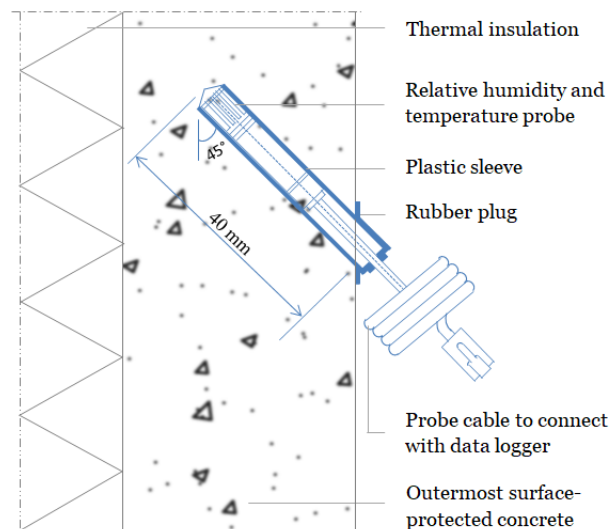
Concrete façade elements of the case structure for hygrothermal behaviour measurement (Publication IV).
